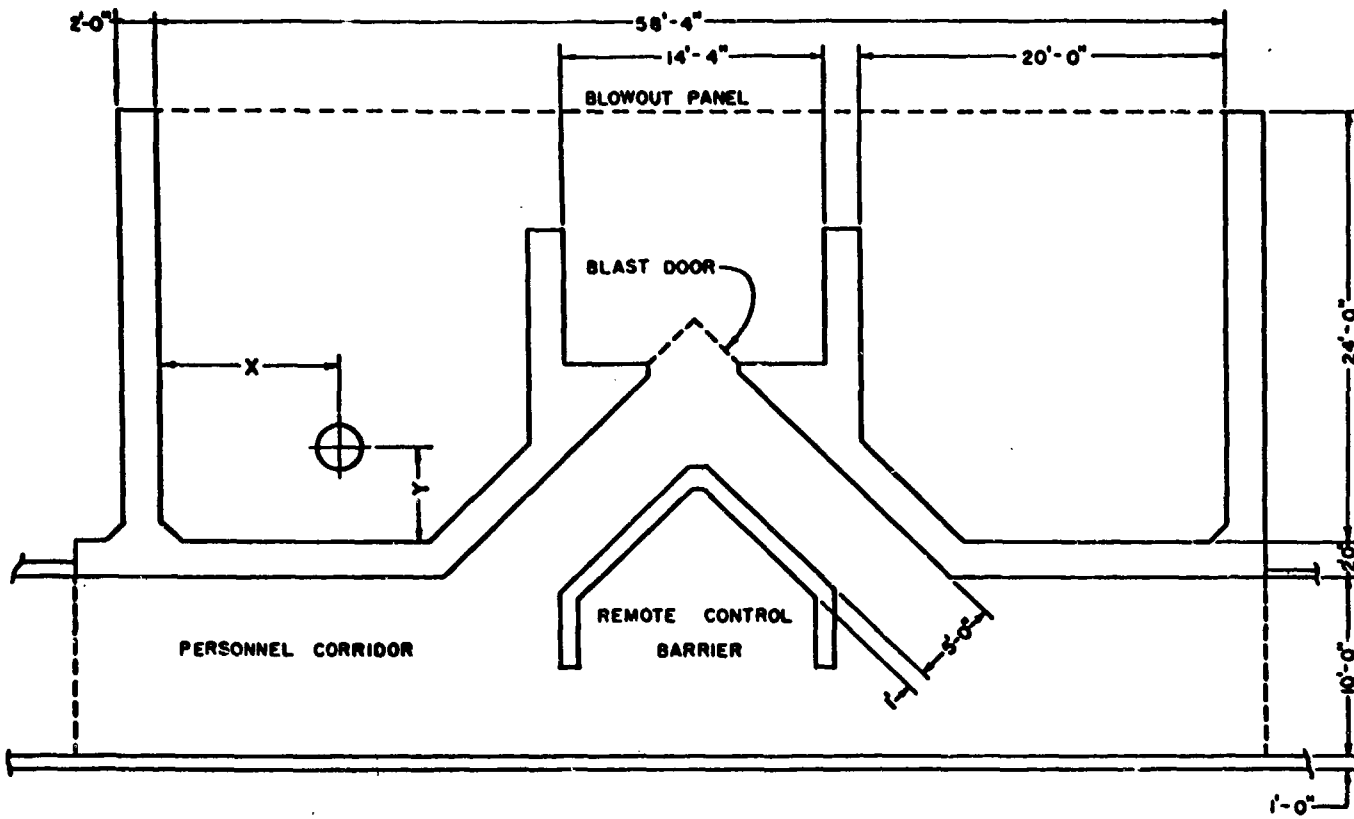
Floor plan of a typical processing bay pair. X and Y coordinates are used to indicate charge location.
